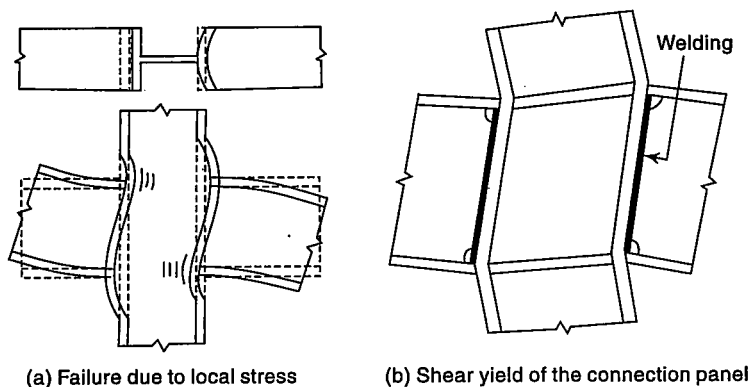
Failure of beam-column connections (Wakabayashi 1986)
